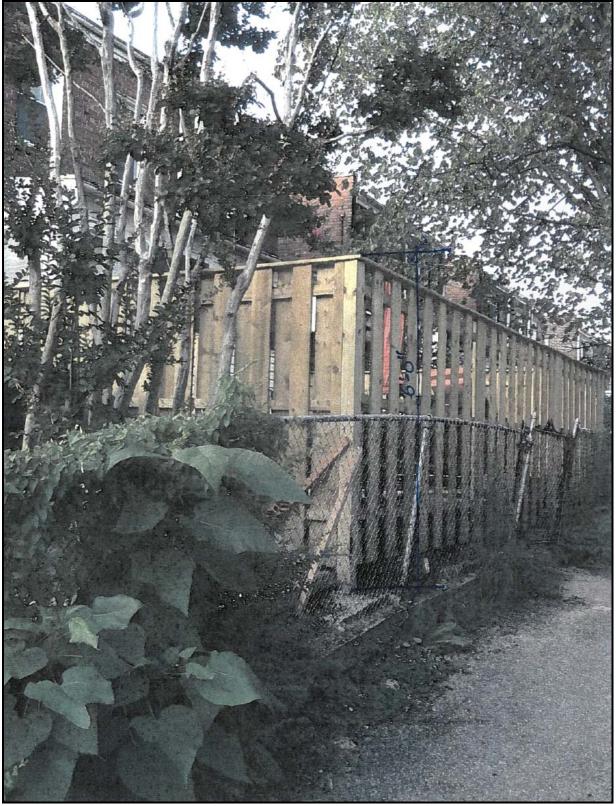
Existing Rear Yard – Proposed 6' high Board-on-Board Fence
